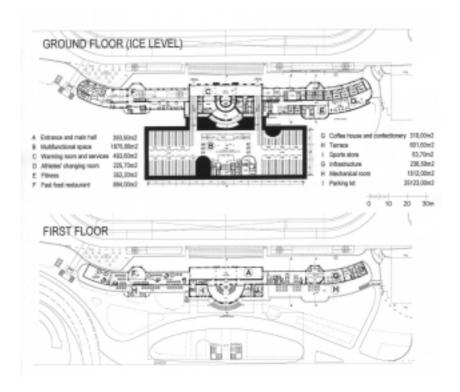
Groundfloor (ice level) and 1 st floor plan of the main building
